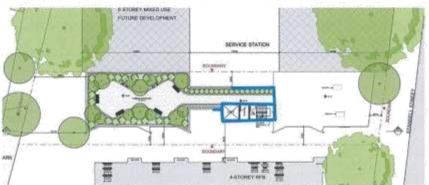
| Amended extract of the roof plan indicating the location of the overrun and balustrade, where the maximum variation occurs (in blue)
